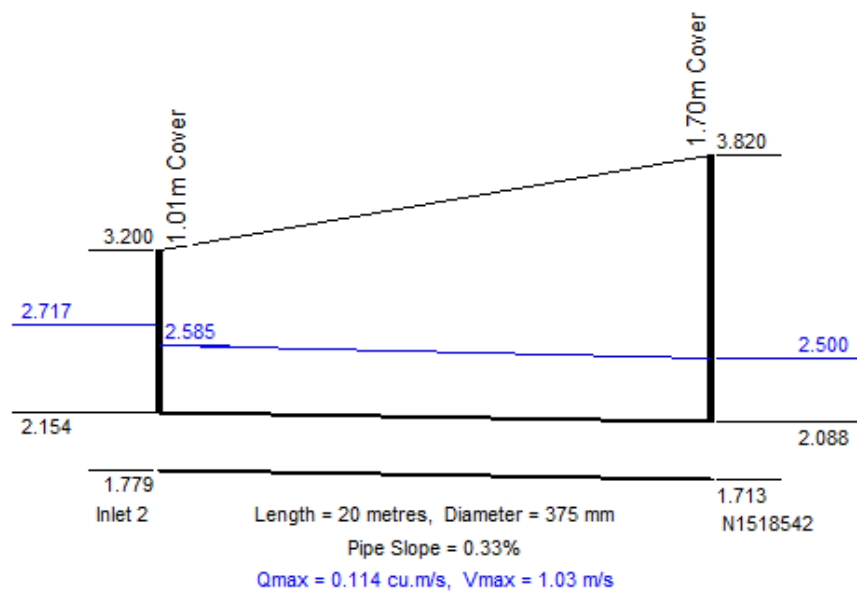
375mm outfall pipe HGL 0.2 EY
